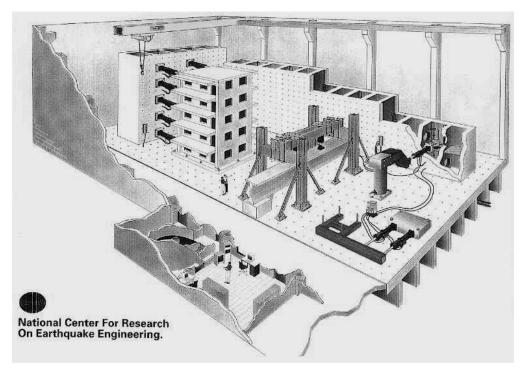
NCREE Reaction Wall and Strong Floor Layout (NCREE 2002)
